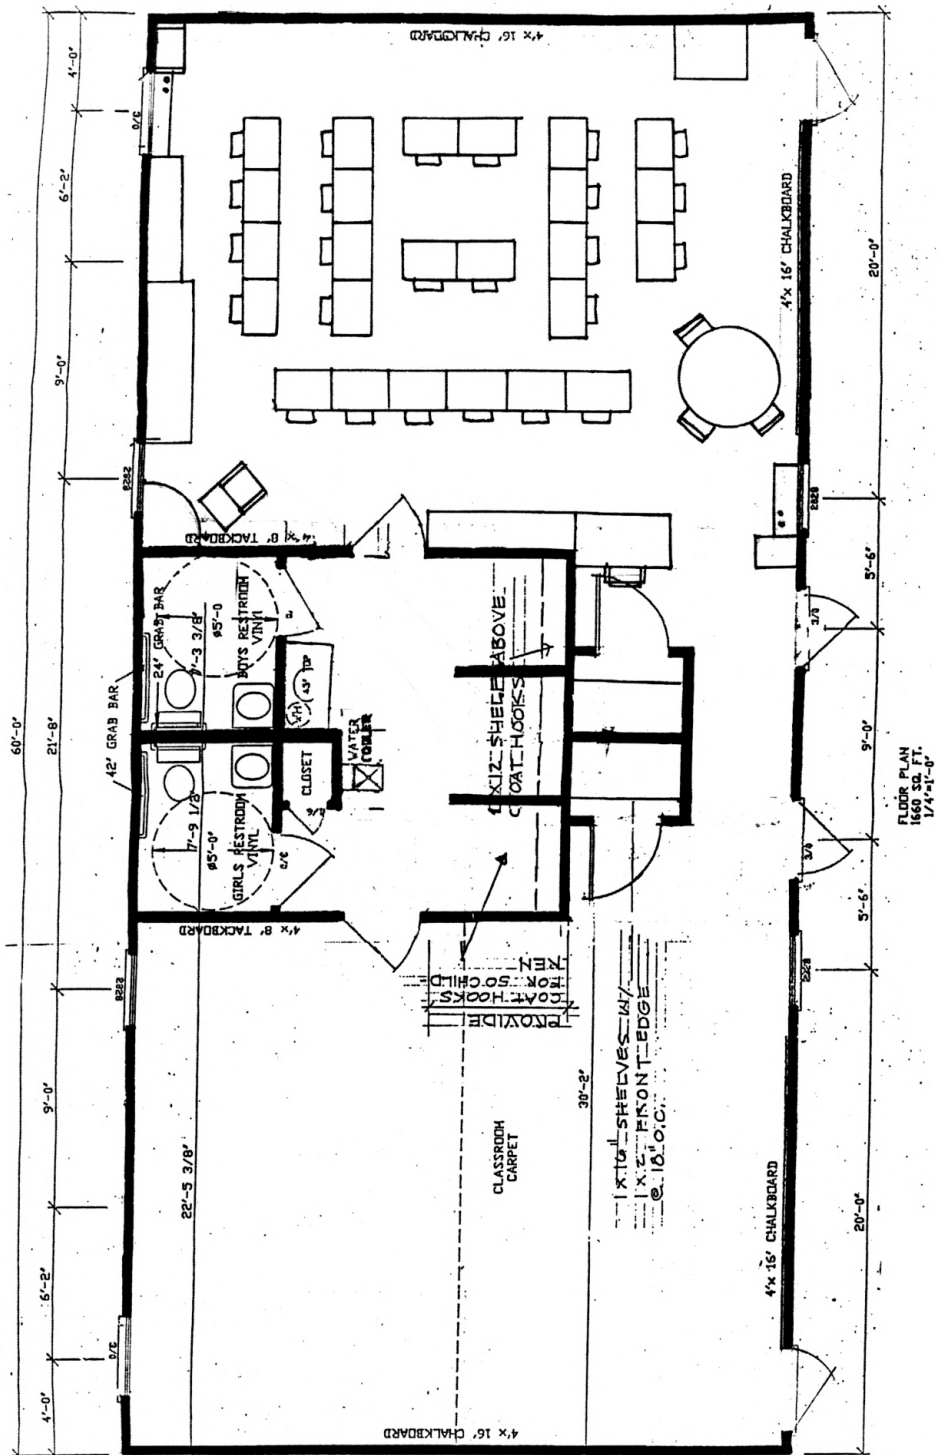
Plan of the relocatable classroom with interior layout of one of the classrooms
